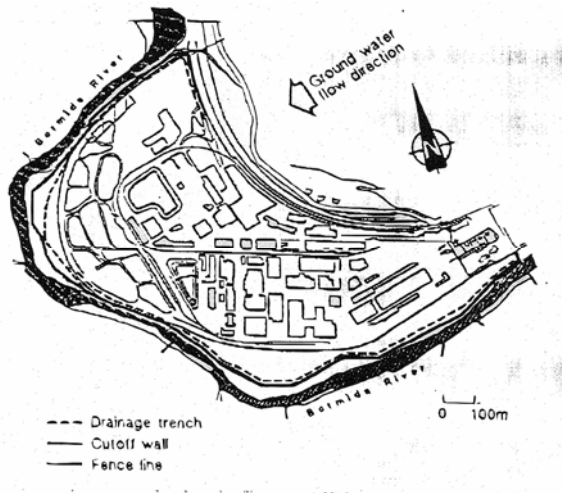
Plan view of the alignment of the slurry wall (adapted from Manassero and Viola, 1992)
